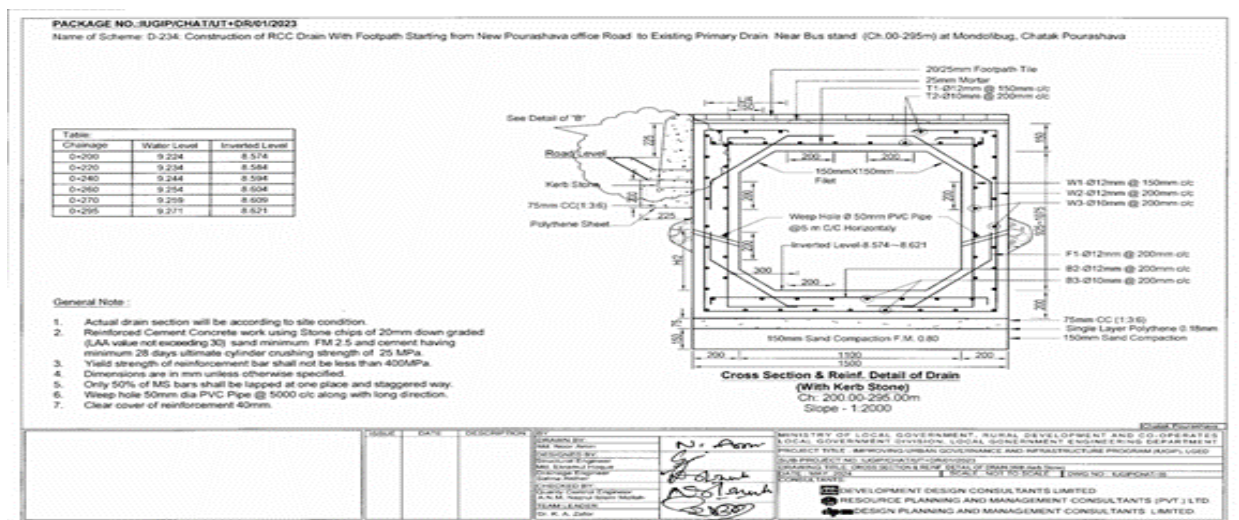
Cross Section of Drain in Chhatak Pourashava
